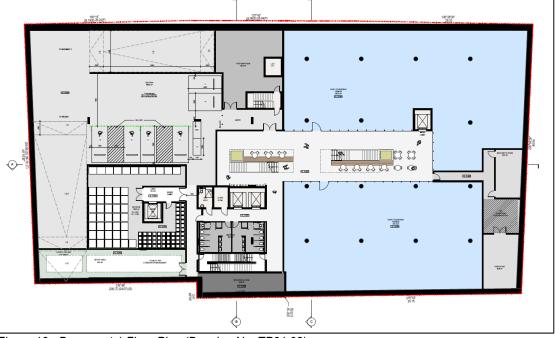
Basement 1 Floor Plan (Drawing No. TP01.03)
